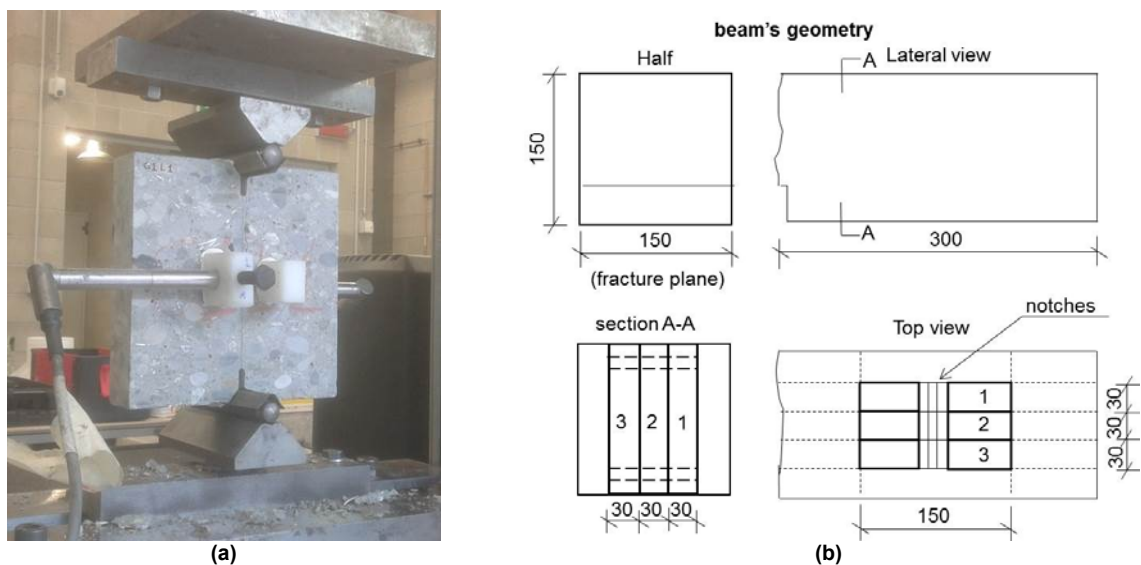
DEWS testing procedures: a) DEWS experimental apparatus; b) beam's cutting planes (dimensions in mm).
